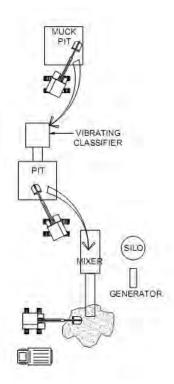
General Layout of the Pre-Mixing Plant Inland (Case 1)
